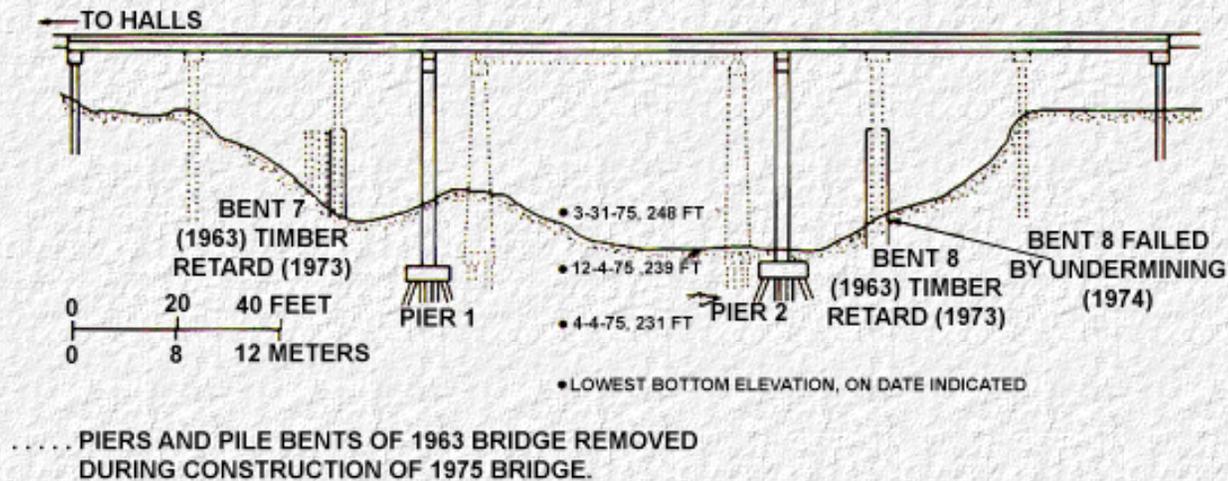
Elevation Sketch of U.S. Highway 51 Bridge
